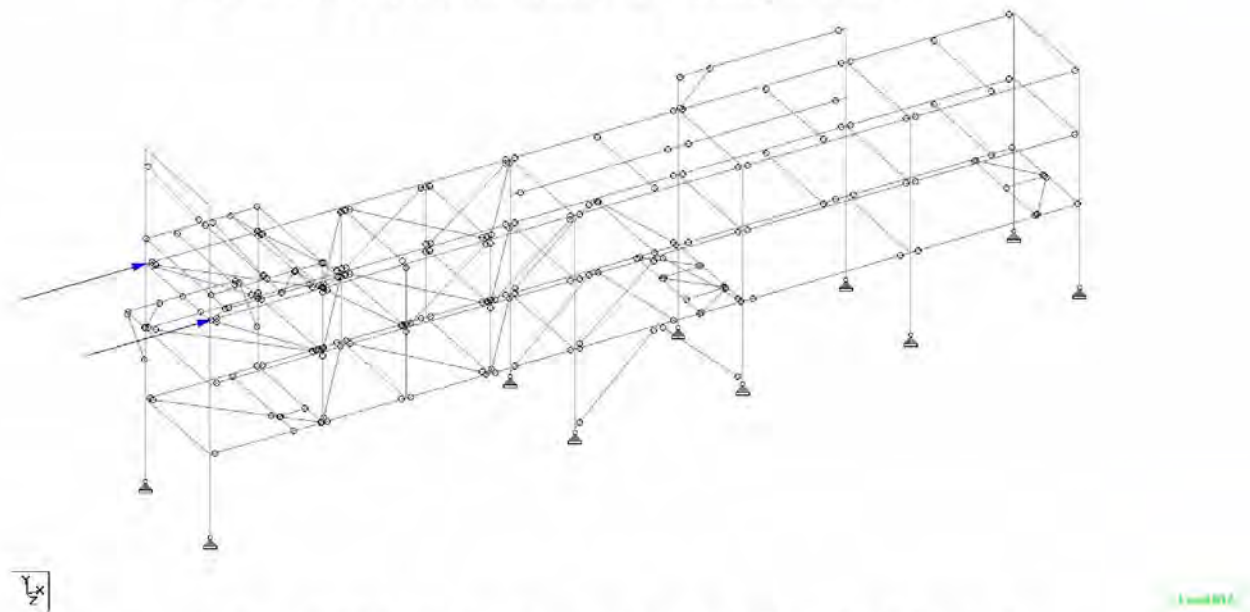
Wind load on structure due to piping (in +X direction)
